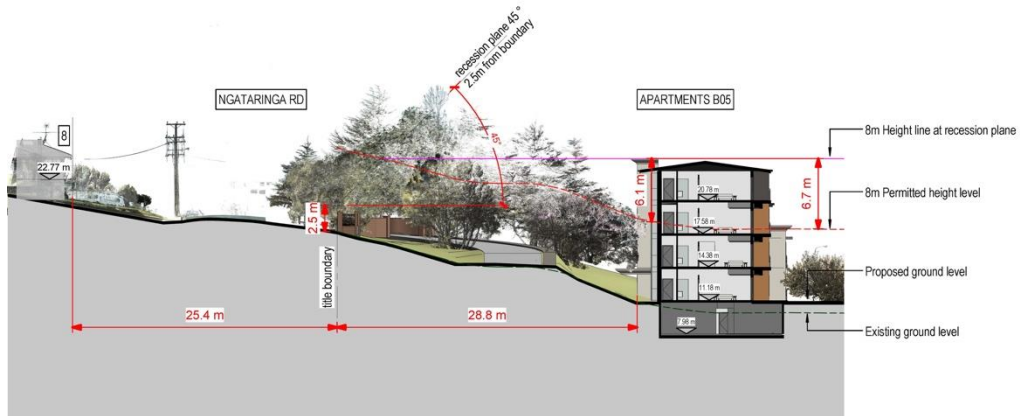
Building B04 Section 1, opposite 34 Ngataranga Road (Ryman Drawing A3-010 RC10).
